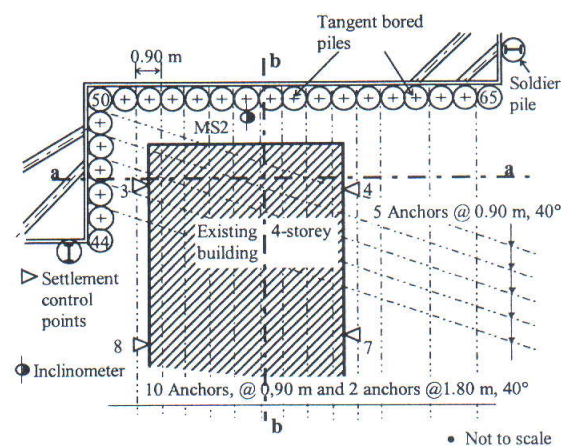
Overlapping of anchors at one of the external corners (Detail-A in Figure 1).
